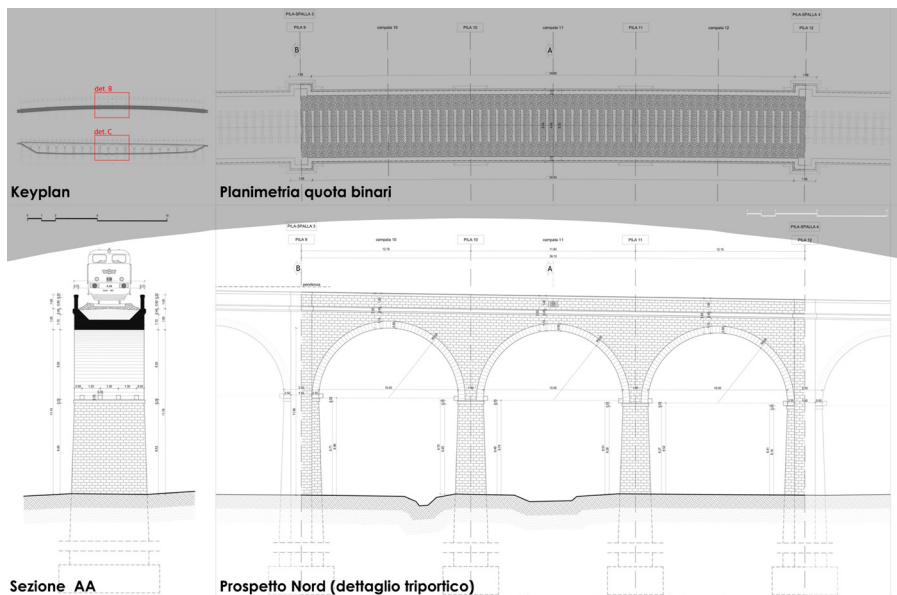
Detail of the tripartite (plan, section and elevation). Graphic elaboration by Pasquale Aiello.
